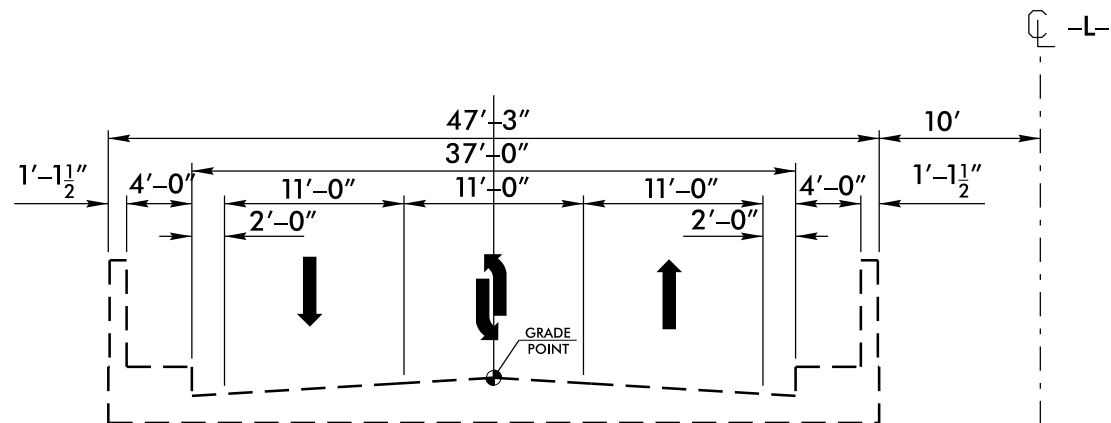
DETAIL OF ROADWAY UNDER PROPOSED STRUCTURE
